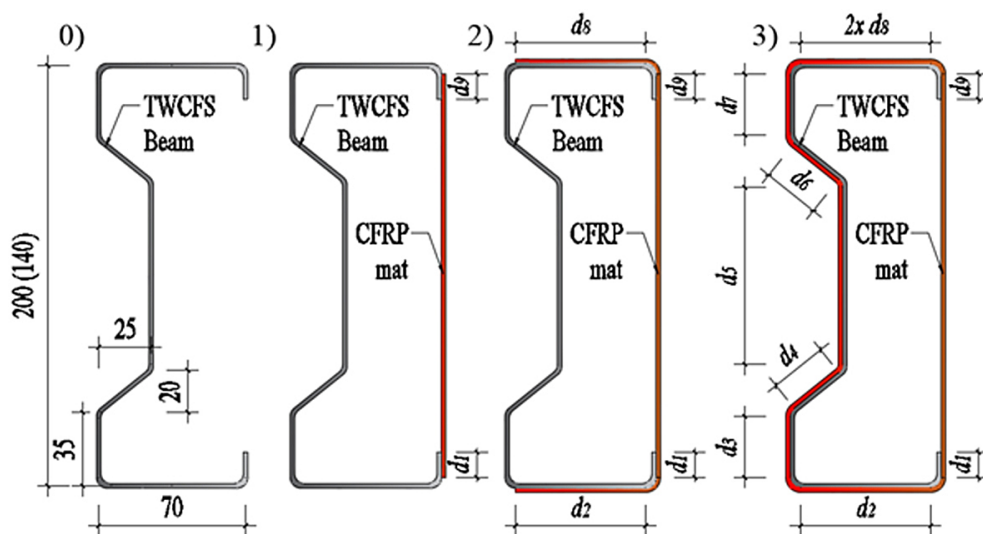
Geometry of tests beams: 0) reference beam, 1) reinforcement glued on edge stiffeners, 2) reinforcement glued on edge stiffeners and flanges, 3) reinforcement glued around the perimeter of the cross-section
